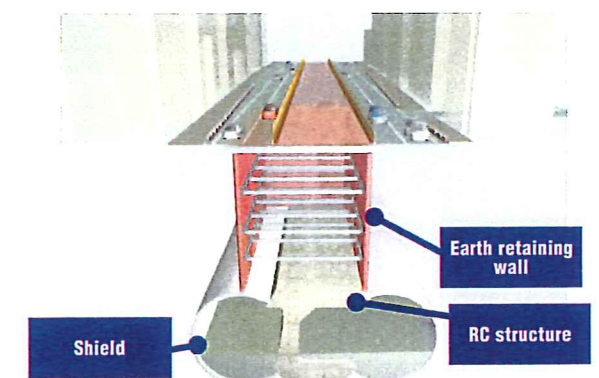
Diagram of construction at the Gotanda Entrance/Exit section
